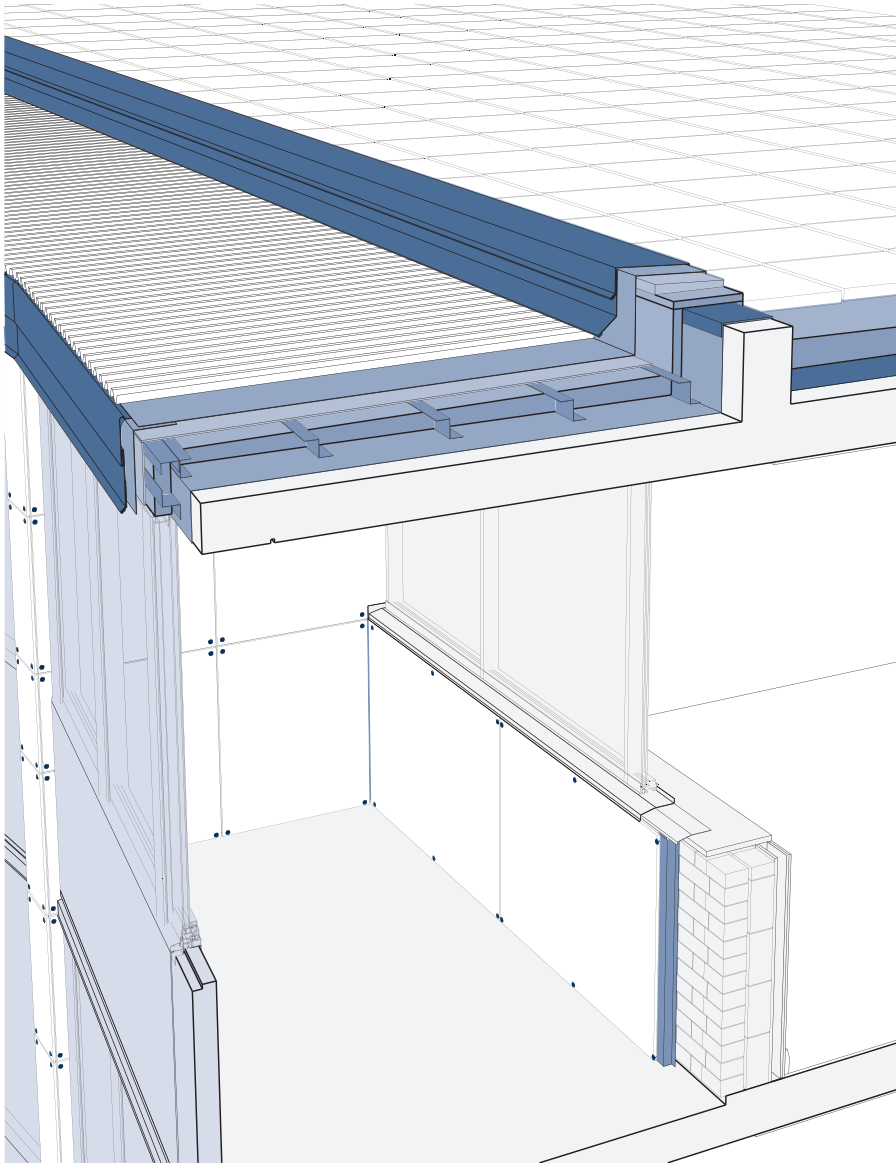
The corrugated metal roofing is installed over the projection roof area, followed by the parapet flashing which completes the roofing replacement sequence.
